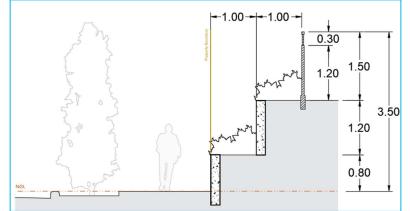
(dii) Retaining wall and fence height - two steps
